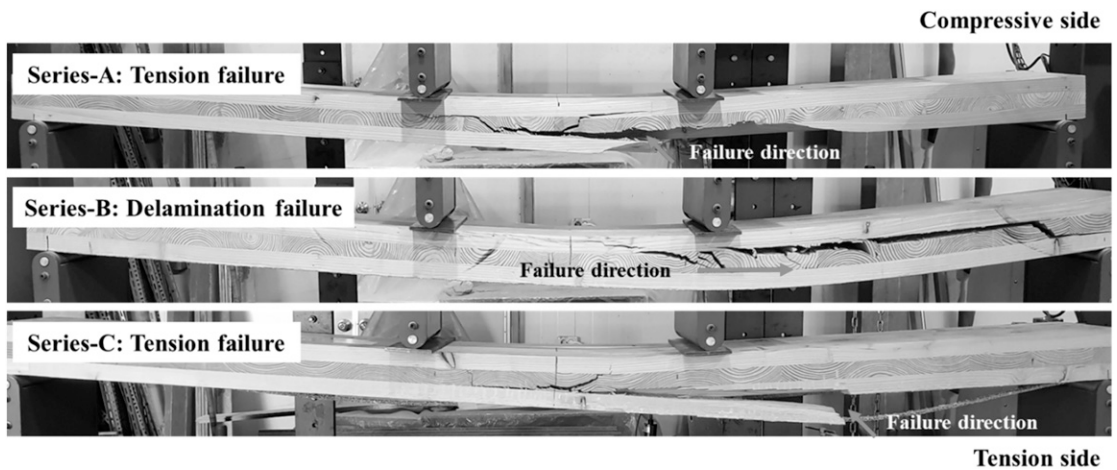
Failure modes of cross-laminated timber (CLT) floor and composite CLT floors.
